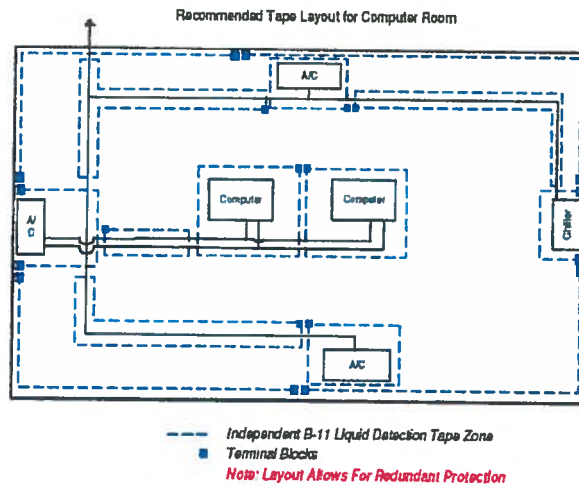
SURROUND THE SOURCE LAYOUT
